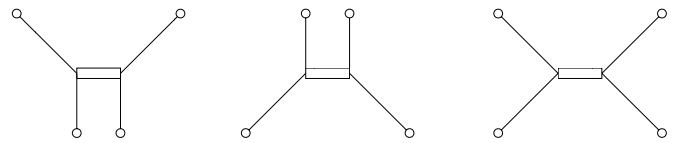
Suspension bridge stabilization in horizontal plane by cambering of main or stabilization cables. Cross-sectional view
